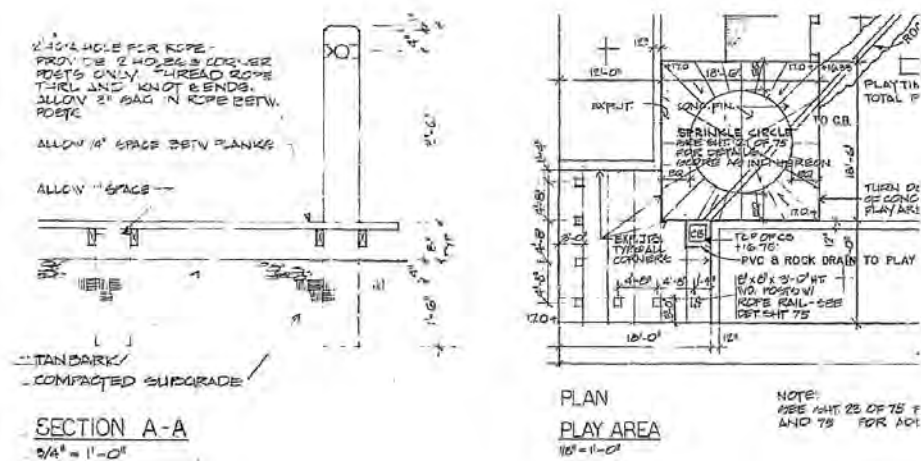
Wood bollards with holes for a rope railing were included in the Bicentennial design of the playground in Section E. These were located at the southwestern entrance to the playground, and were arranged in an L-shaped pattern. (Excerpts from Sheet 75, Sheet 20, ETIC 831_41018A).
